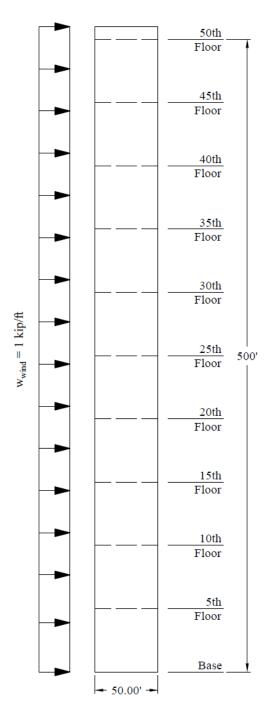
Reinforced Concrete Shear Wall Geometry and Loading
